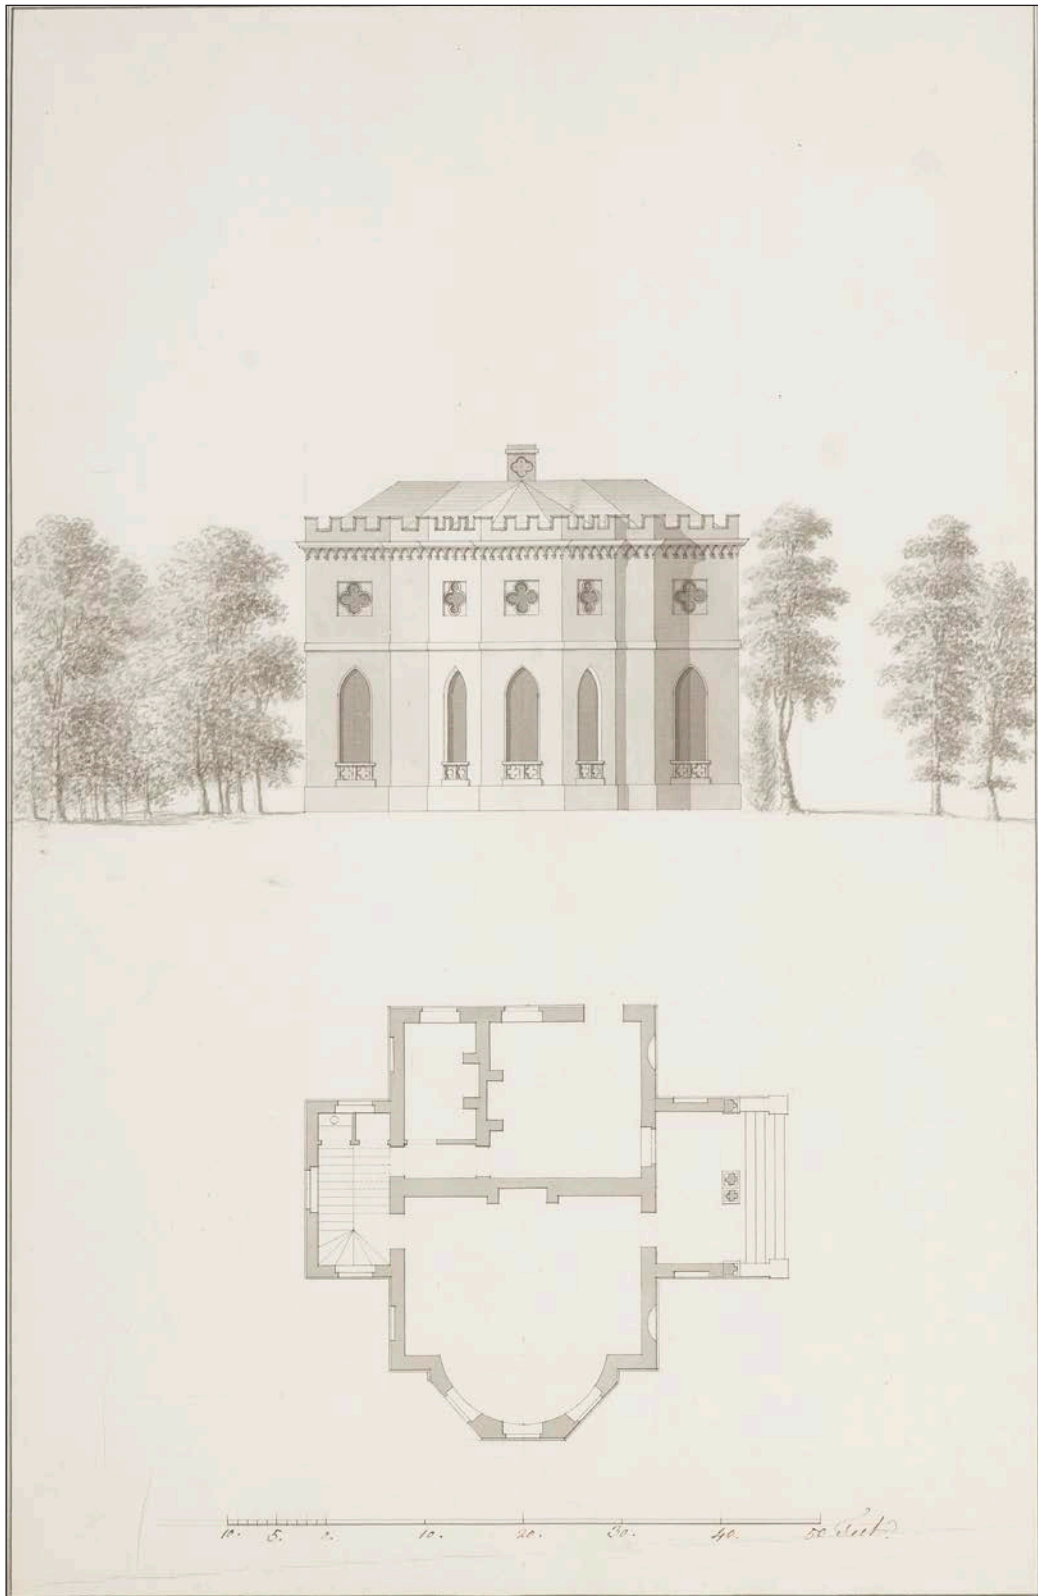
Banqueting house, side elevation with plan, to stand above Rothley Lower Lake, Northumberland, n.d. c.1760s. (National Trust Collections 582325.1) wallington@nationaltrust.org.uk www.nationaltrust.org.uk www.nationaltrust.org.uk/wallington/features/rothley-lake-a-hidden-gem
